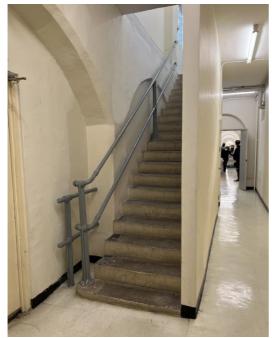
An internal staircase attaching to its enclosed wall (Left).
